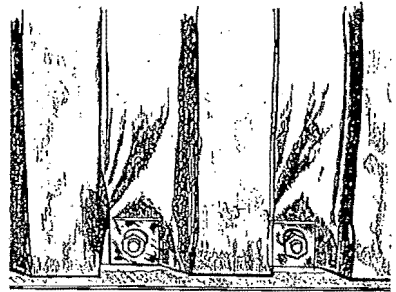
Local Deformation of Steel Sheet near H.S. Bolted Connection
